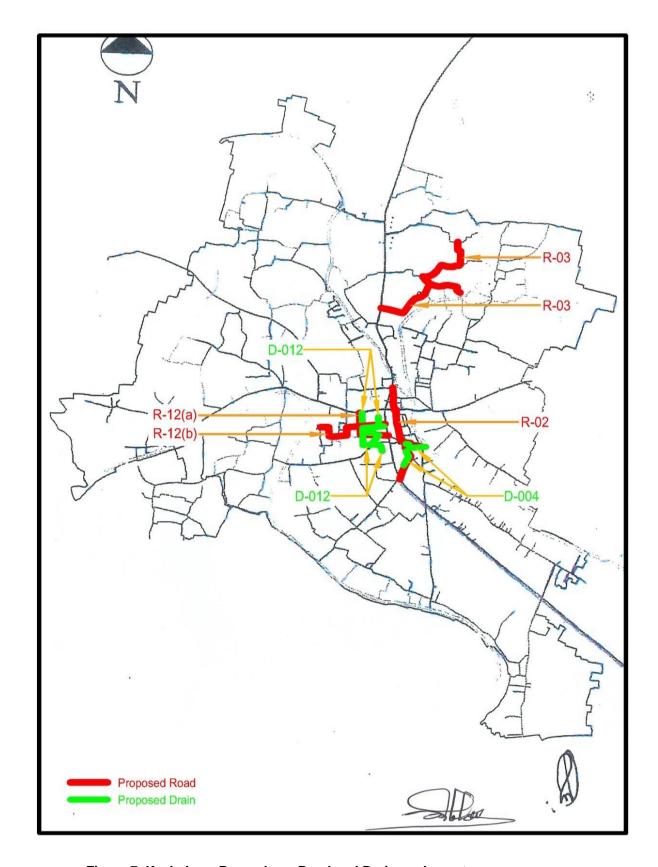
Keshabpur Pourashava Road and Drainage Layout
